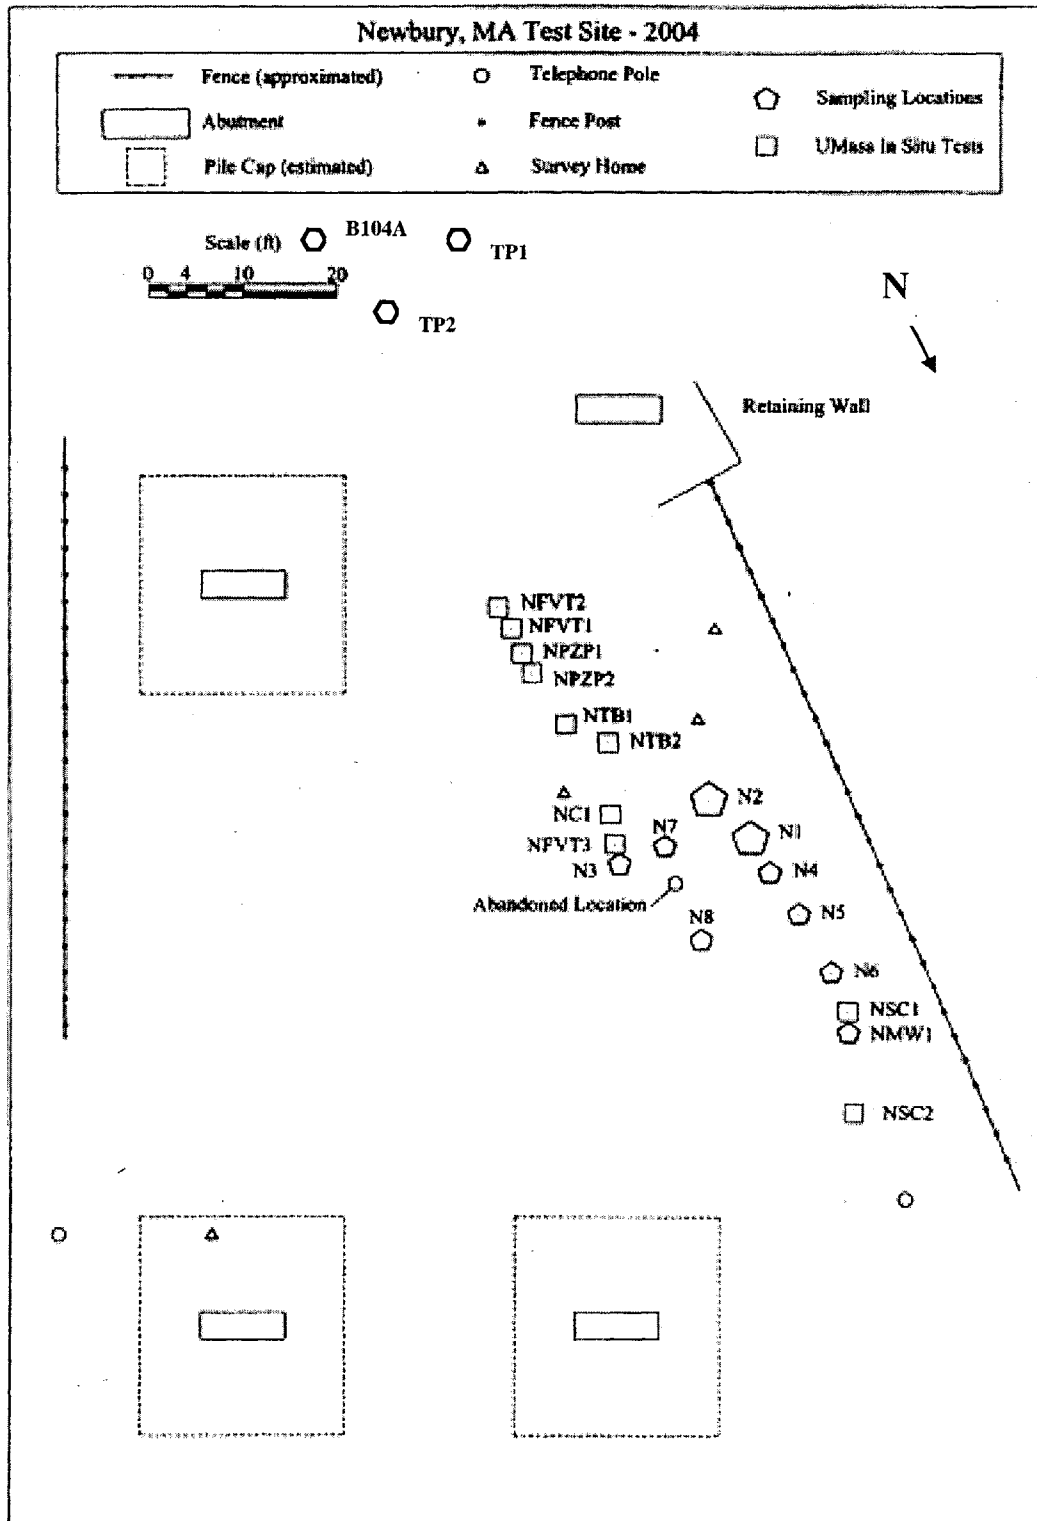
Newbury Field Test Site Plan with Boring Locations (based on figure from Degroot et al., 2004)
